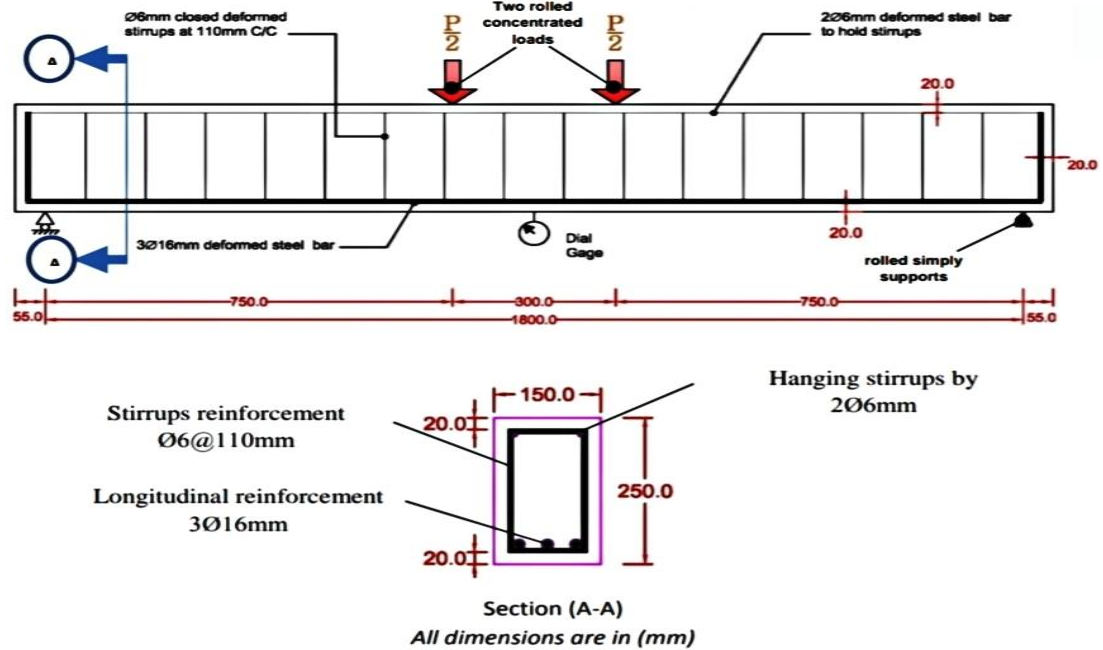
Setup of beams with reinforcement arrangement[71].
